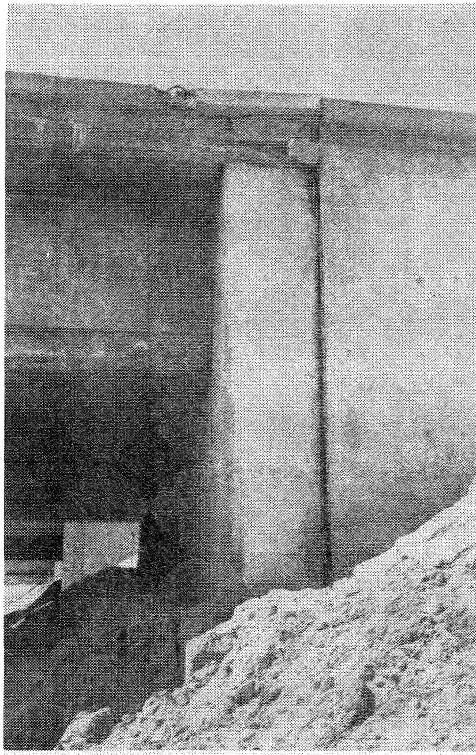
Pounding damage at the joint between the abutment structure and wingwall at the eastern end of the Sierra Highway undercrossing, Angelope Valley freeway.
